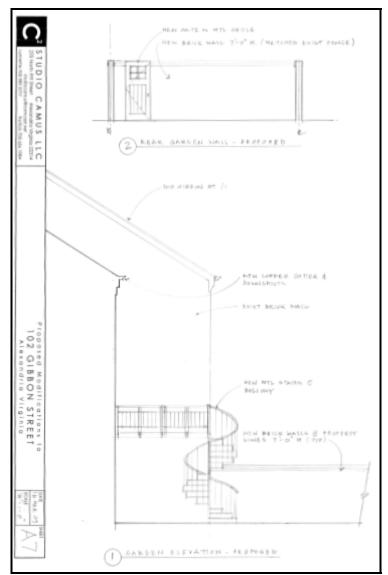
Proposed rear brick wall/gate and deck/stair detail.
